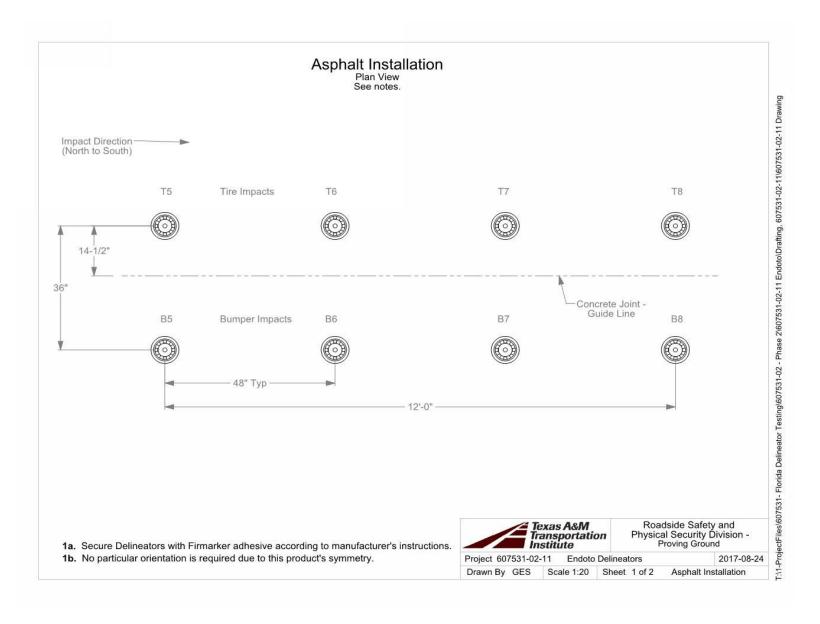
607531-02-11 Test Setup Details on Asphalt Surface (Epoxy).
